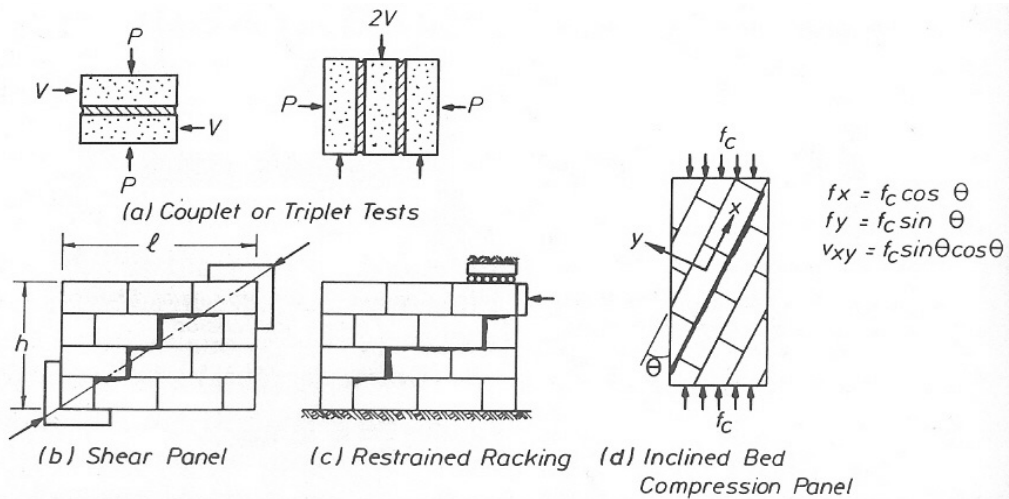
Methods of testing shear strength in masonry construction (Paulay and Priestley, 1992).
